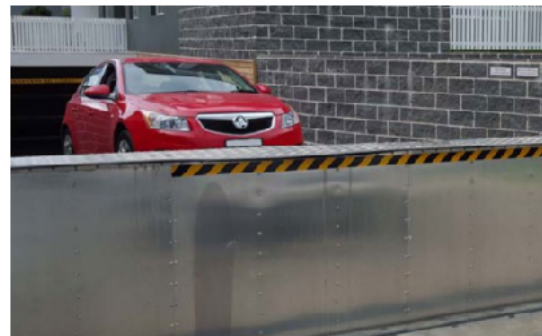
A self-actuating vertical rise flood barrier protects the entrance to a basement.
